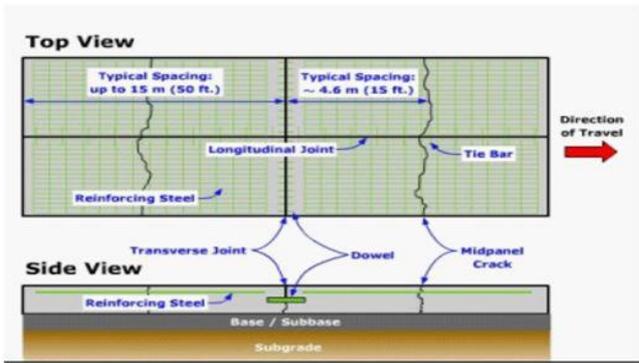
Jointed Reinforced Concrete Pavement (JRCP)
